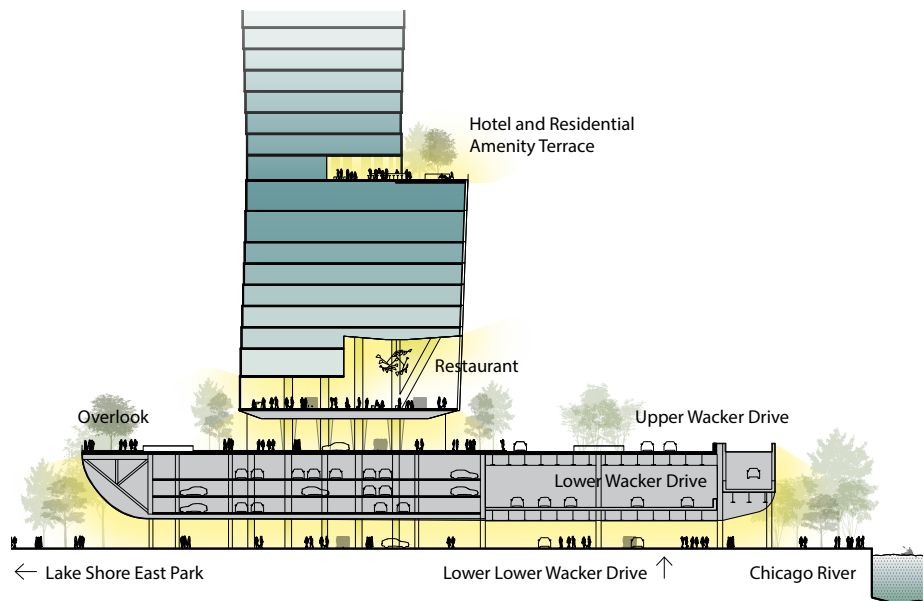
Resisting the fortress-like bases typical of many supertall towers, Vista enhances connections to the ground plane with new access points to Upper Wacker Drive, defining a generous connection between park and river. Additionally, publicly accessible spaces are distributed throughout the tower.
